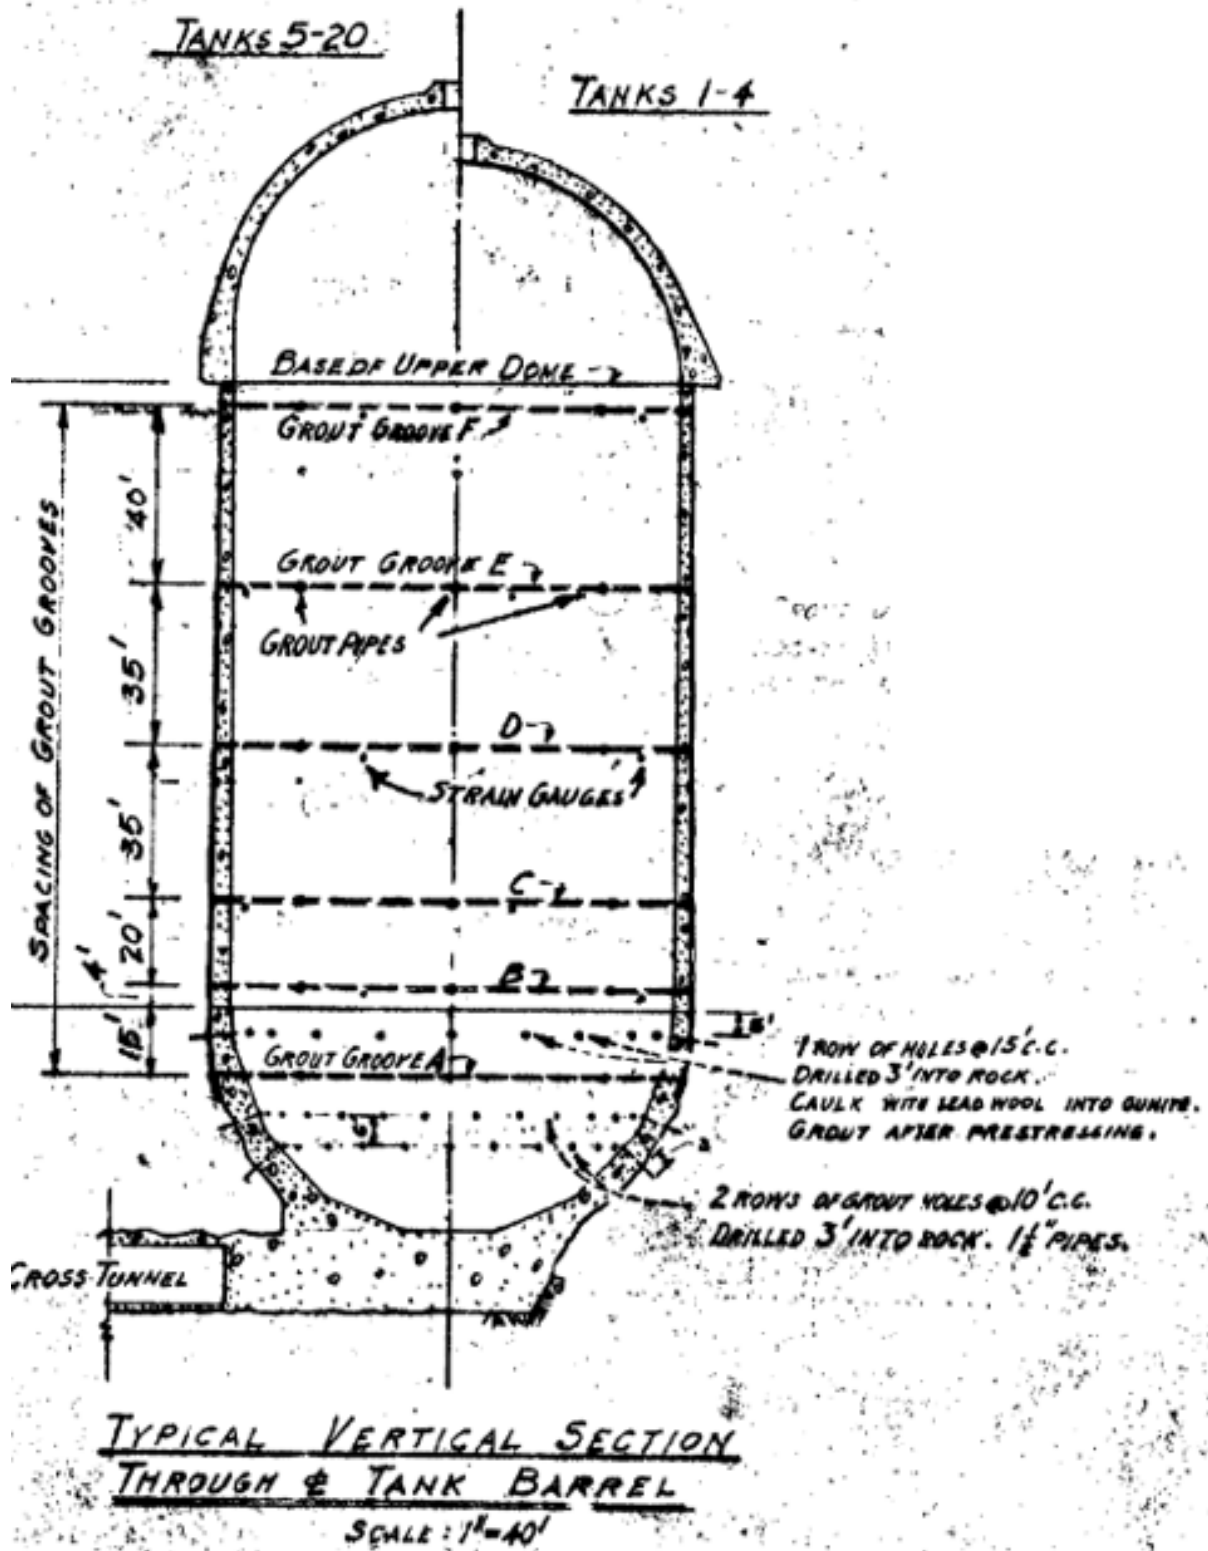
Typical Vertical Section Through Centerline of Tank with Grout Grooves
